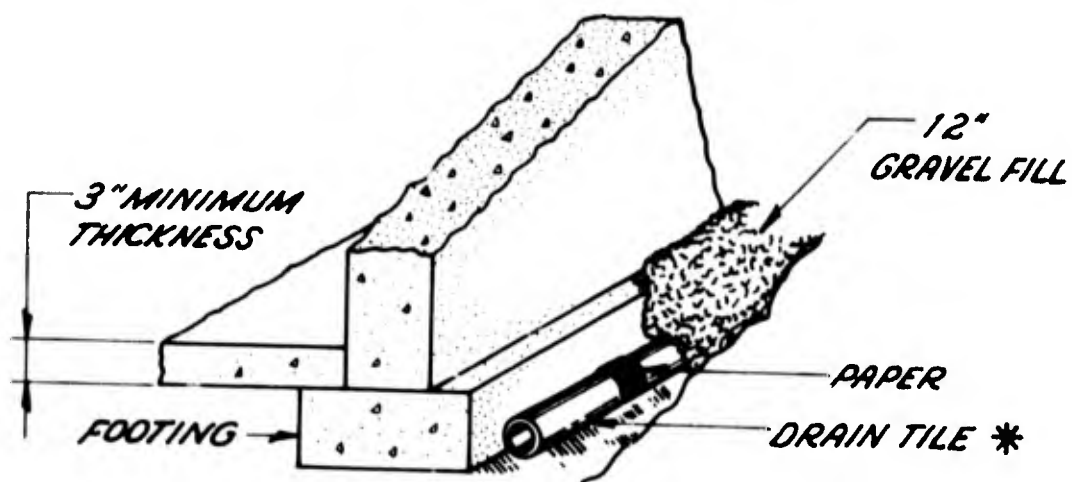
Foundation drainage. Alternative locations for drain tile are shown above.
